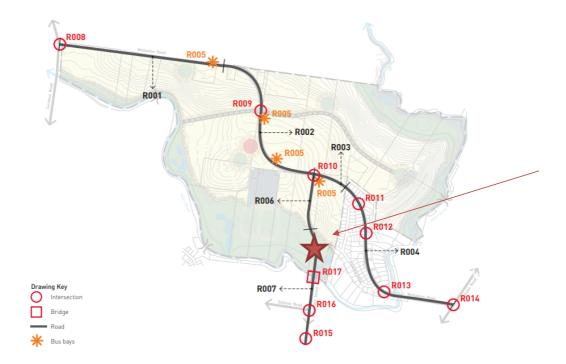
Subject site as shown in underlying framework plan (source: NMSP)
